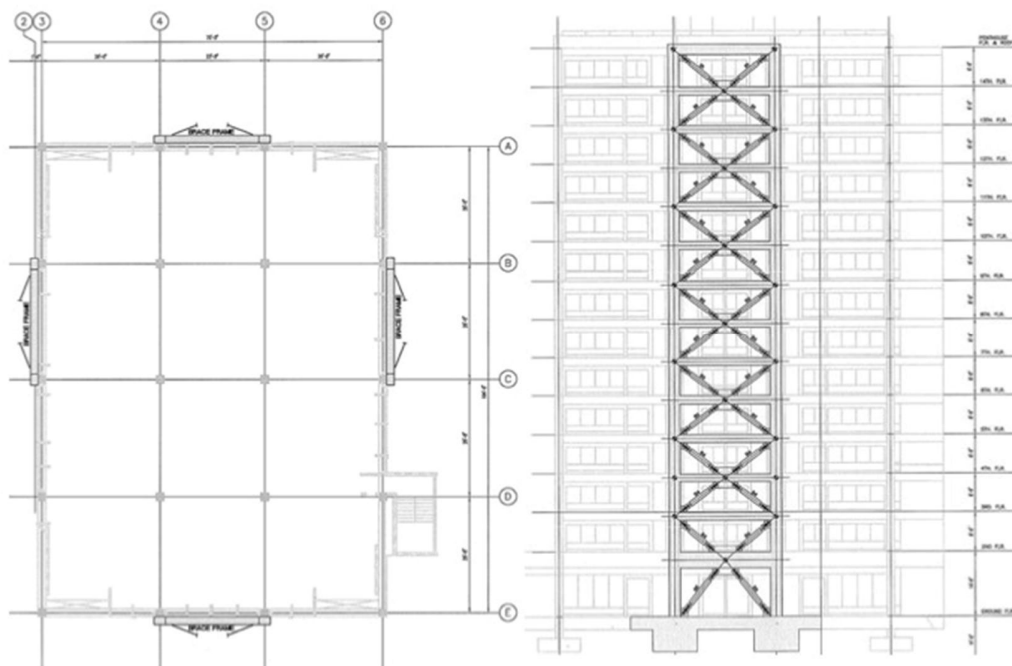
Typical floor plan and one facade of retrofitted building (Islam et al. ,2006)
